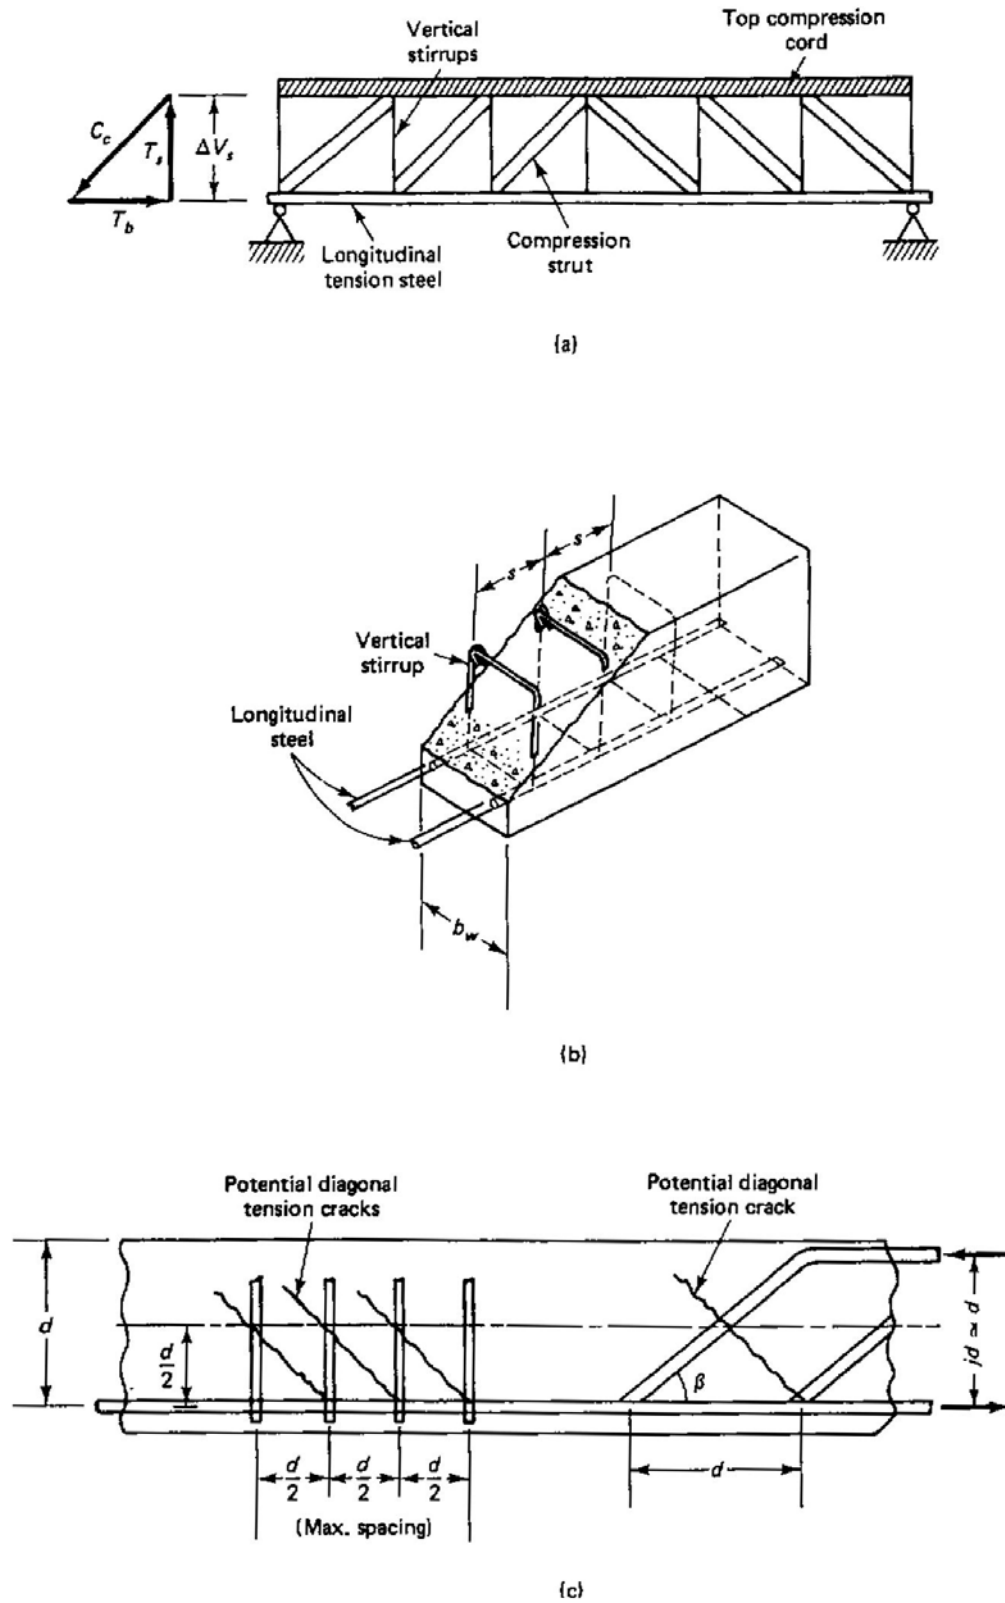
Web steel arrangement. (a) Truss analogy for vertical stirrups. (b) Three-dimensional view of vertical stirrups. (c) Spacing of web steel.
